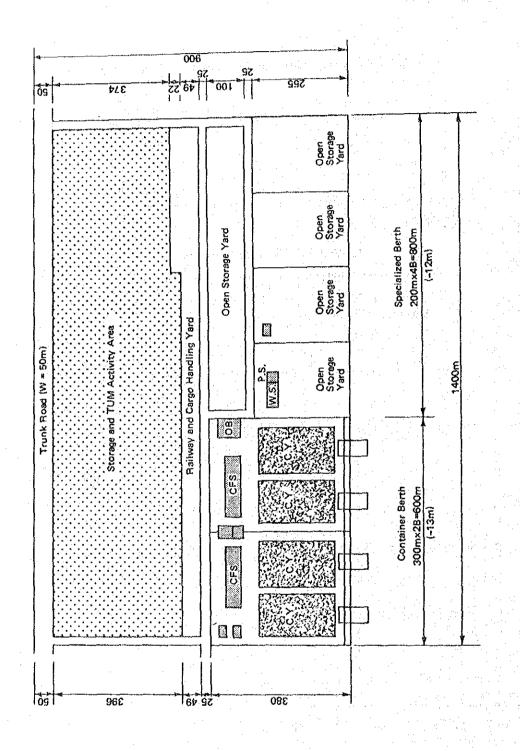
Master Plan of Lazaro Cardenas TUM (Linear Type)
